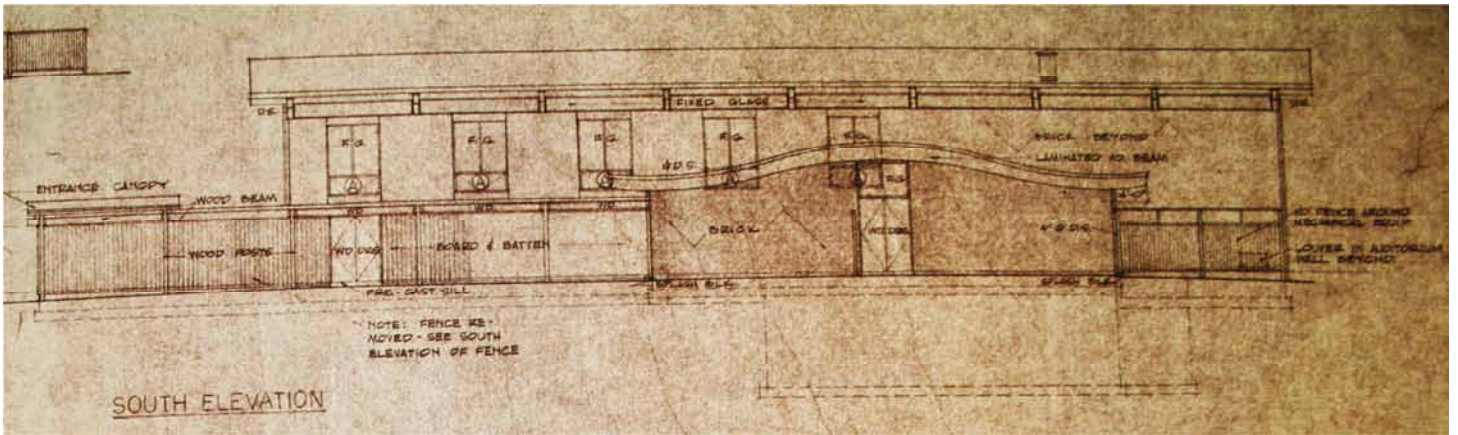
South Elevation. Keys, Lethbridge & Condon elevation, 1963; M-NCPPC files.
